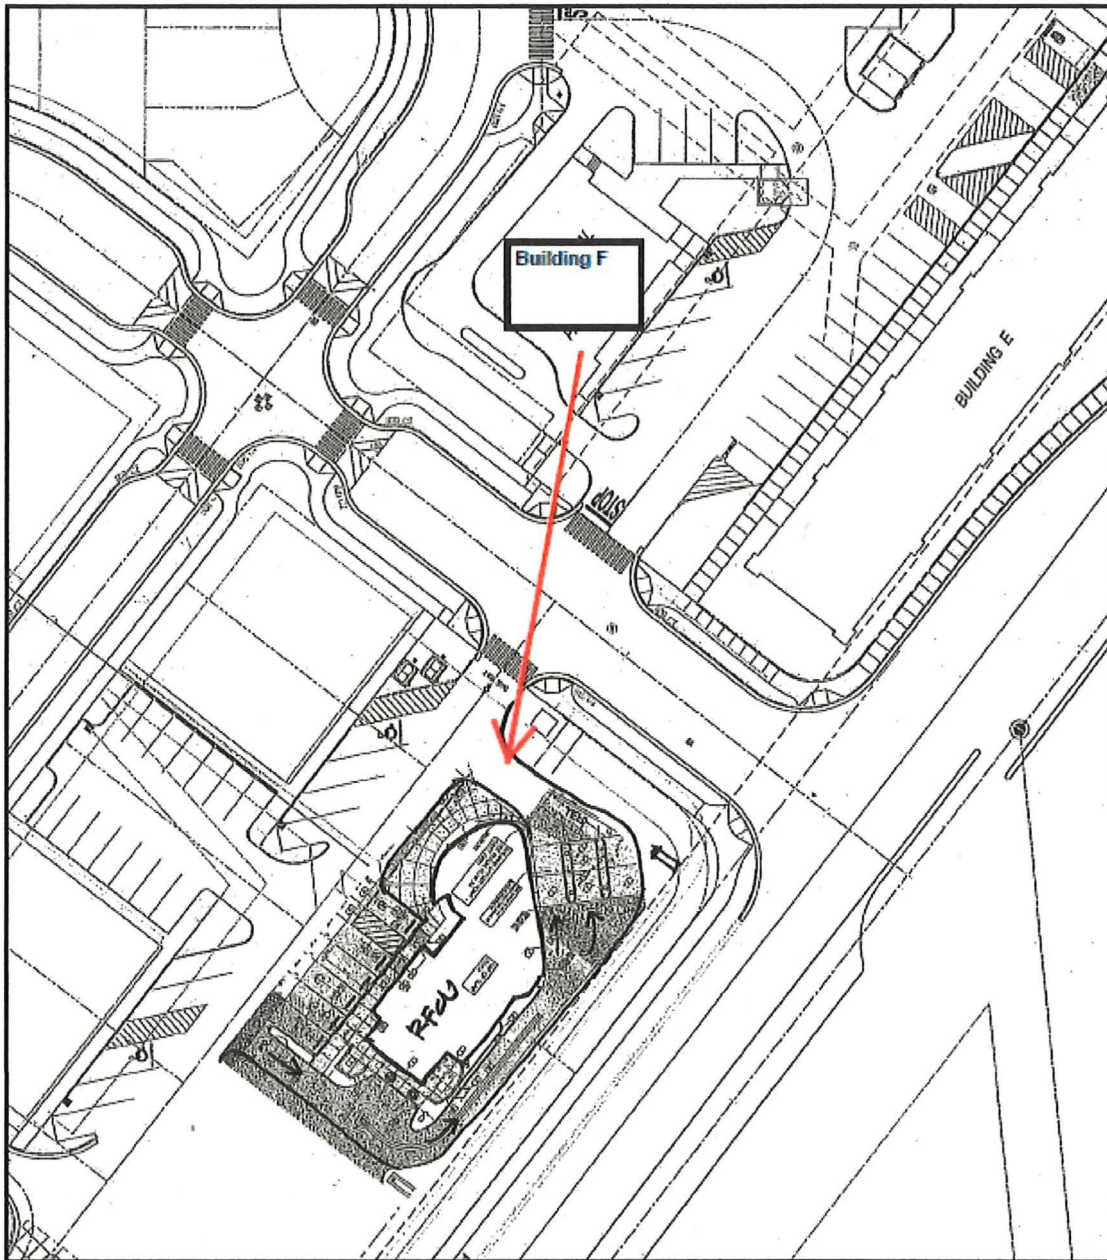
EXHIBIT A ORIGINAL APPROVED CLEARVIEW SITE PLAN
